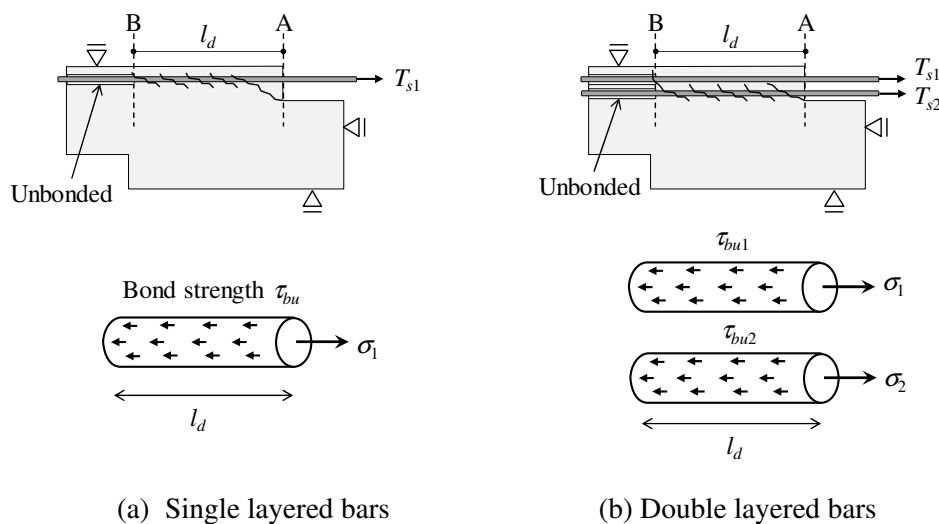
Pullout test of longitudinal bars embedded in concrete
